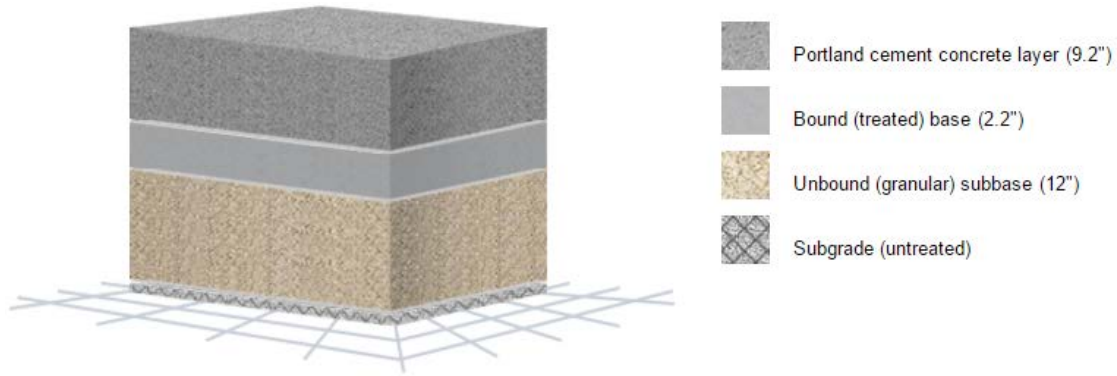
Pavement structure of LTPP Segment 40-4160
